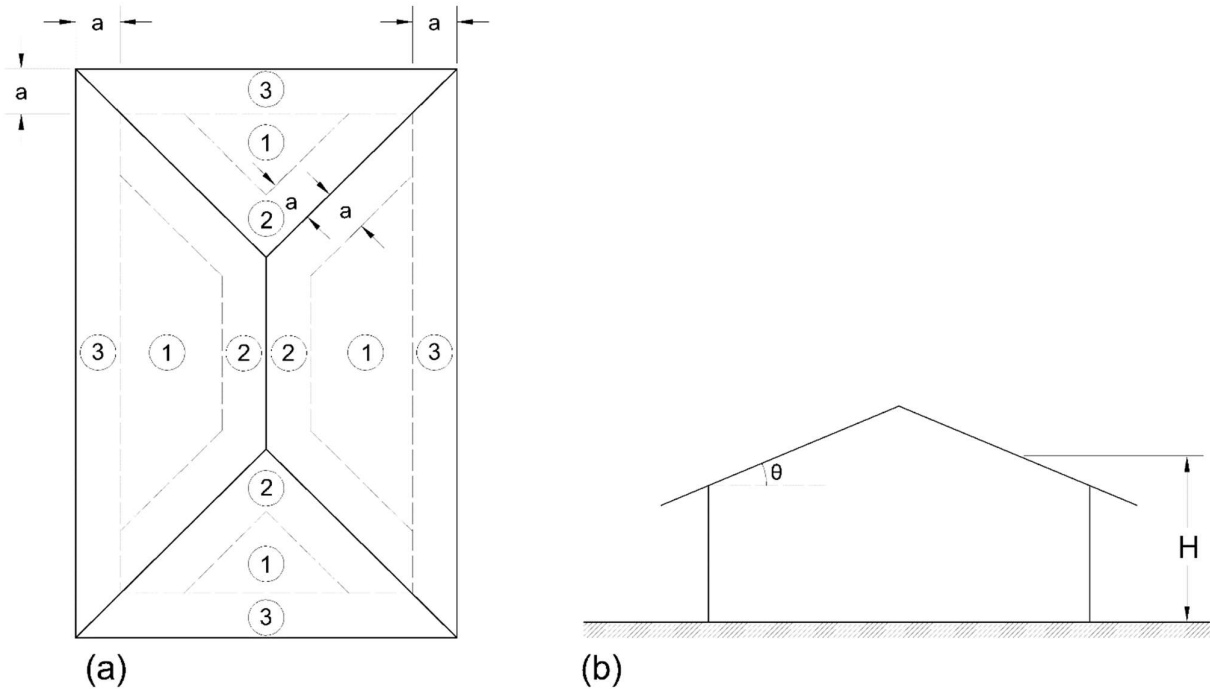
Plan (a) and elevation (b) views of low-rise hip roofs ($H \leq 18.3$ m) for roof zone identification according to Chapter 30 of ASCE 7-22 (2022). With reference to the plan view, $a = 10\%$ of least horizontal plan dimension or $0.4 * H$, whichever is smaller, but not less than either 4% of least horizontal dimension or 0.9 m. if an overhang exists, the edge distance shall be measured from the outside edge of the overhang. The horizontal dimensions used to compute the edge distance shall not include any overhang dimensions.
